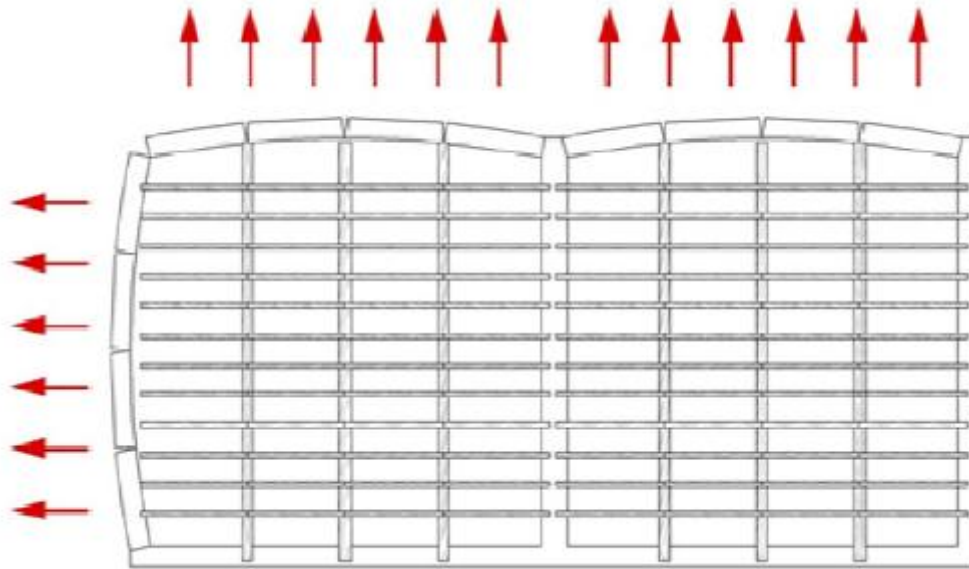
Typical failure due to inadequate strength of the vertical elements supporting the diaphragm (from E. Vintzilaou – “Lecture notes on Advanced Mechanics of Masonry”)
